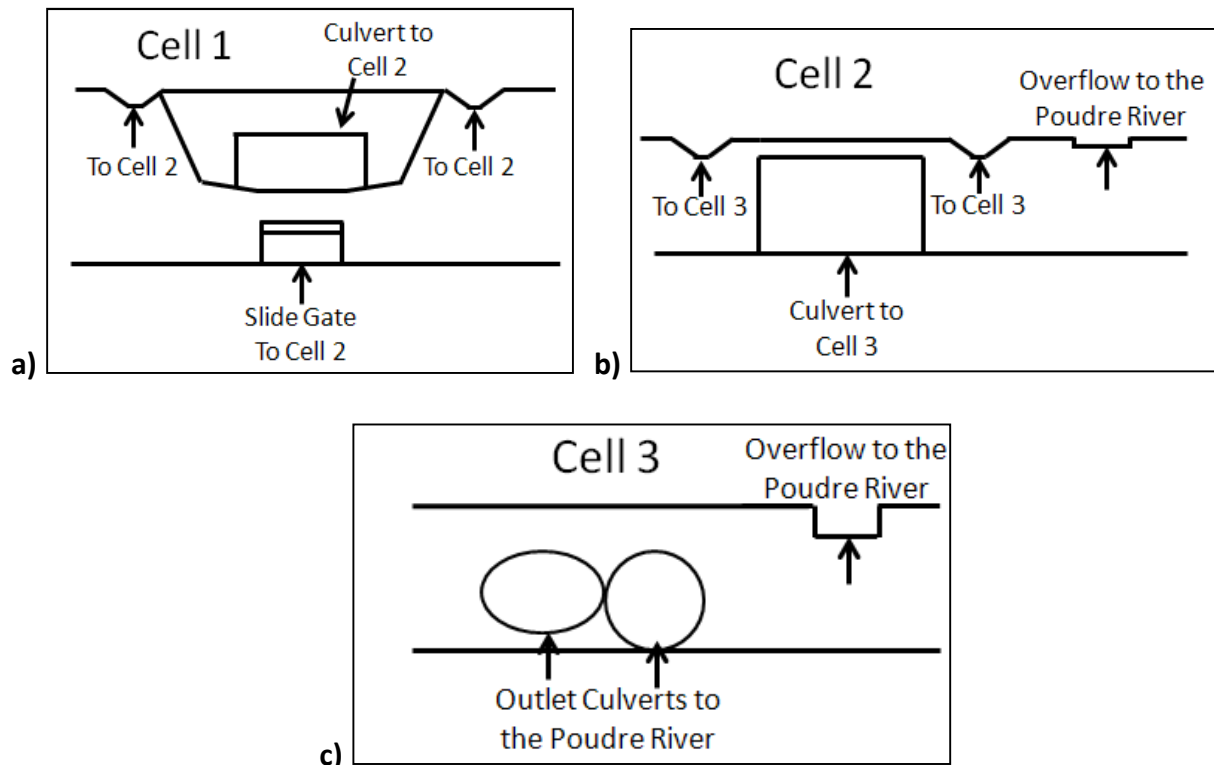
Sketches of the wetland’s current outlets that are included in the SWMM model (not to scale): a) Cell 1’s WQCS, culvert, and overflow weirs b) Cell 2’s culvert and overflow weirs, and c) Cell 3’s culverts and overflow weir.
